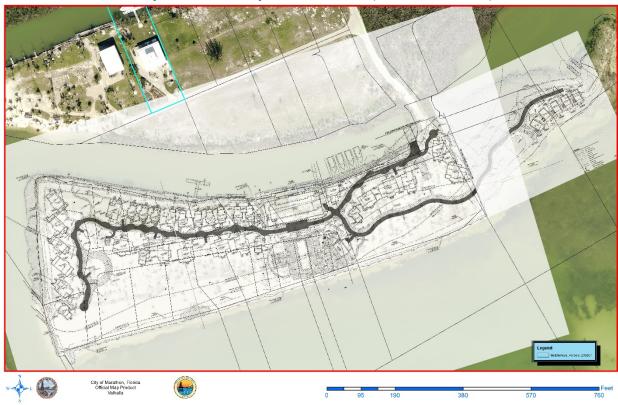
Proposed Redevelopment Site Plan (Ecstasy Portion)
